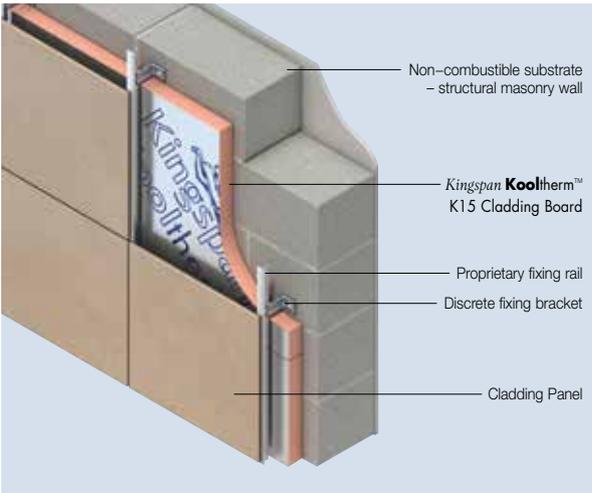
Insulated Cladding Systems on Solid Concrete Blockwork
